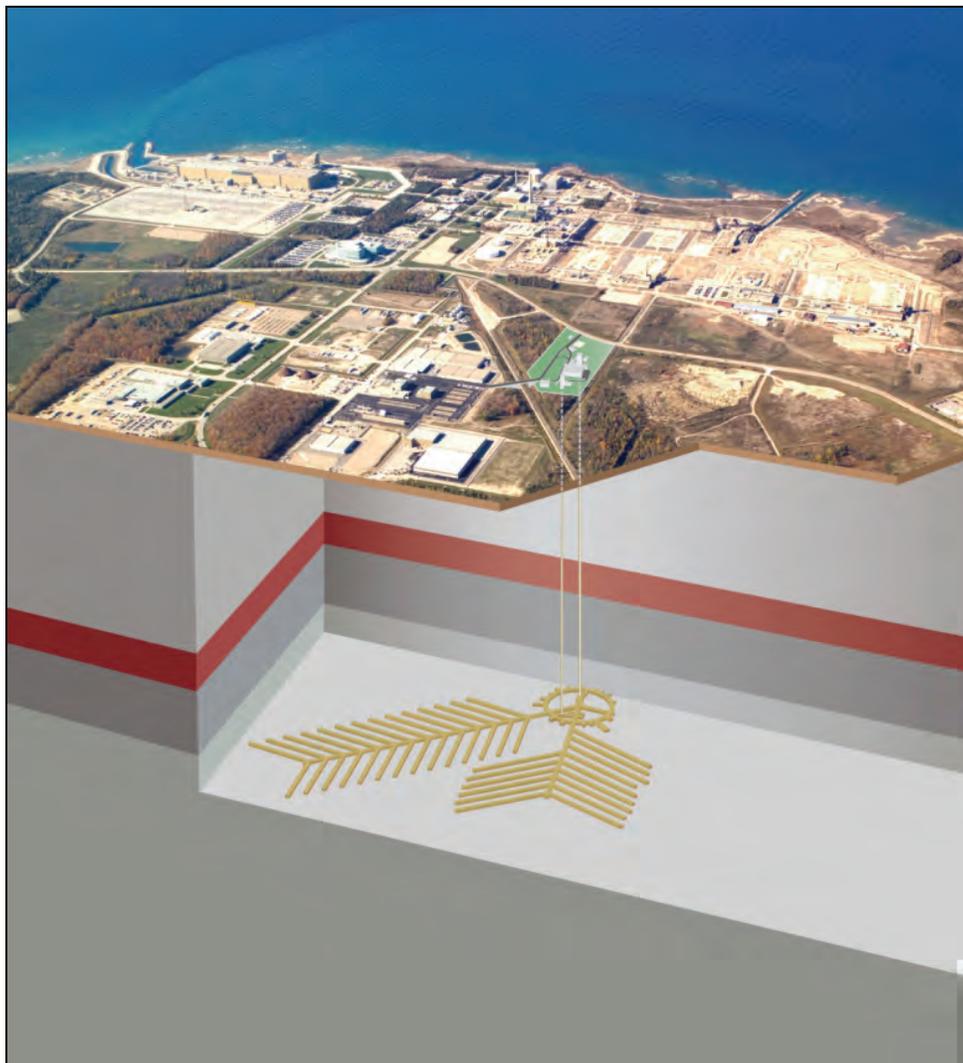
Conceptual Layout of the DGR Below the Bruce Site
